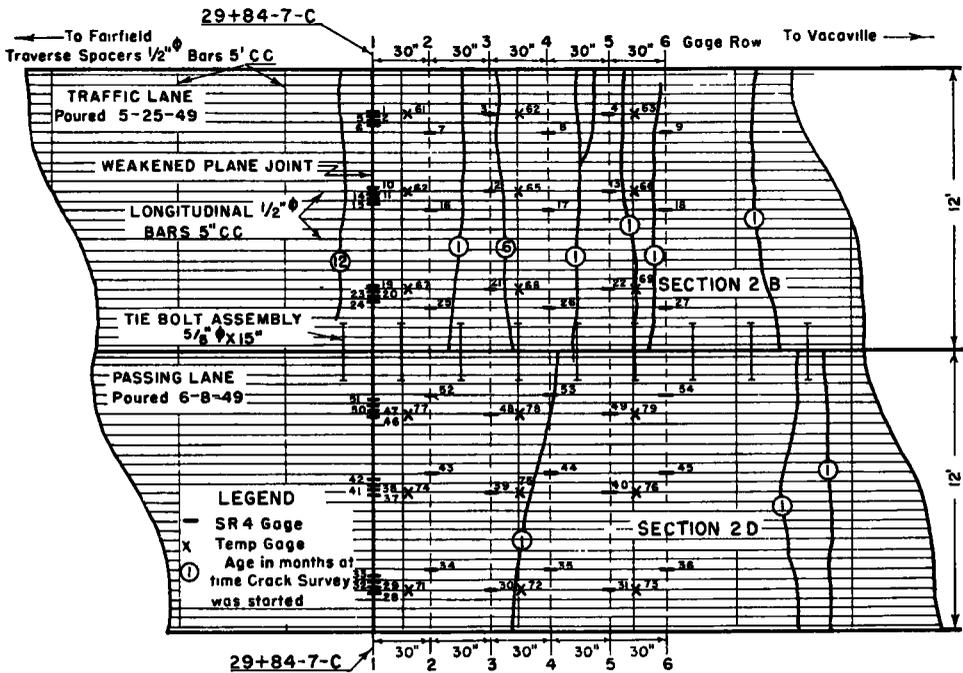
Plan of Placement of SR-4 Gages on Steel and Crack Formation—Sections 2-B and 2-D
